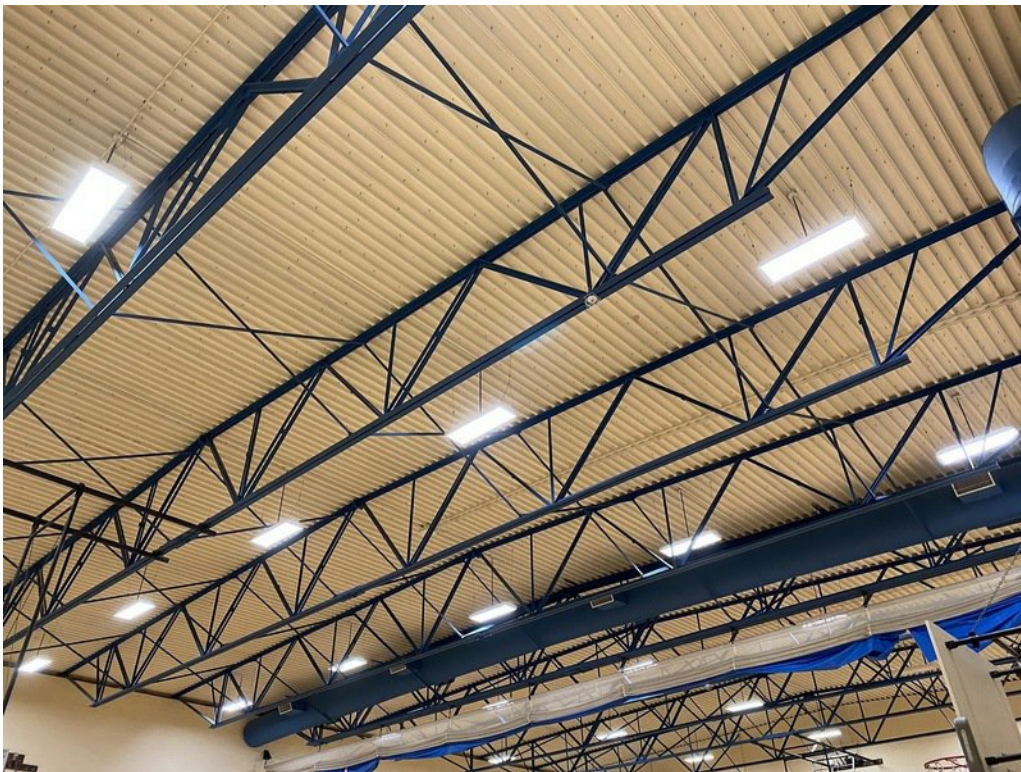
Gym Interior Looking at Open Web Steel Joists and Underside of Roof.
